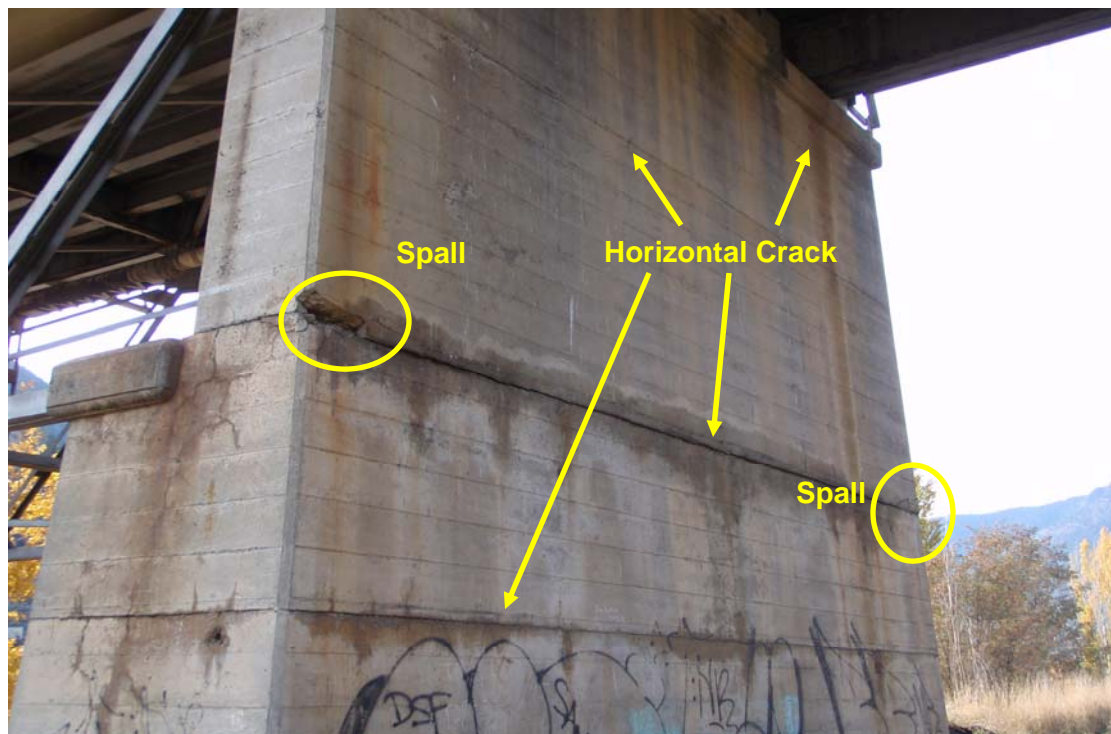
Four Horizontal Cracks and Two Spalls in North Side of Pier 5
